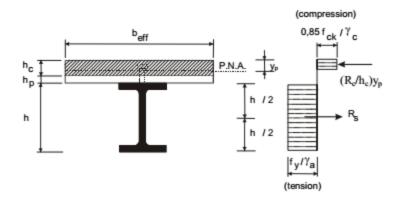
Plastic stress blocks when PNA lies in concrete slab
